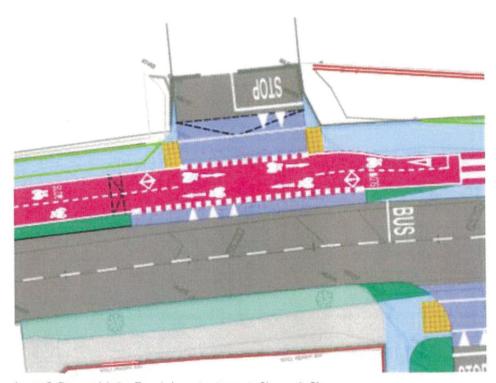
Proposed Active Travel plans at entrance to Simpson's Shop.
